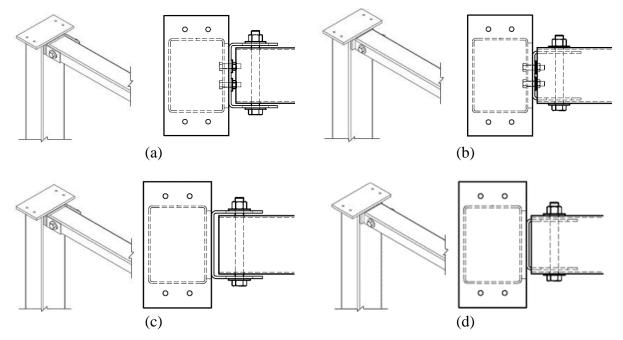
Ground Line Strut Design Concepts: (a) No. 1 - Bolted Yoke Outside Strut, (b) No. 2 - Bolted Yoke Inside Strut, (c) No. 3 - Welded Yoke Outside Strut, and (d) No. 4 - Welded Yoke Inside Strut
